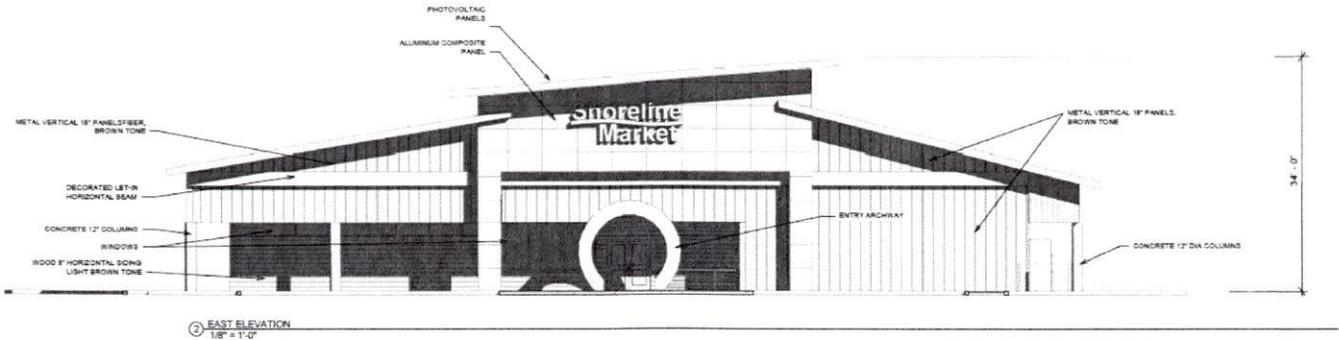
Example Main Wall Sign Above Store Entry (East Elevation)
